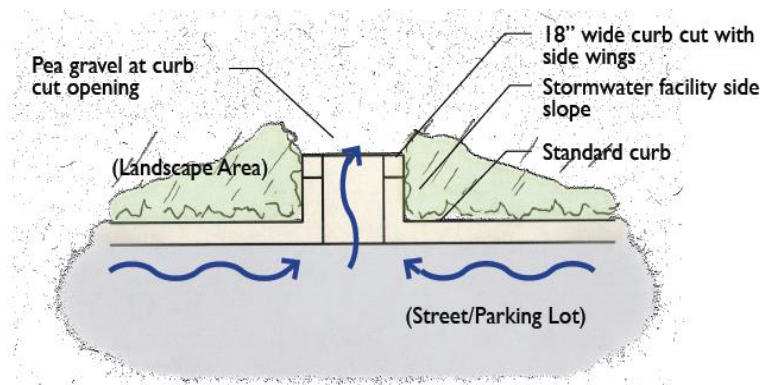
Standard curb cut with side wings: plan view (Source: SMCWPPP, 2009)
